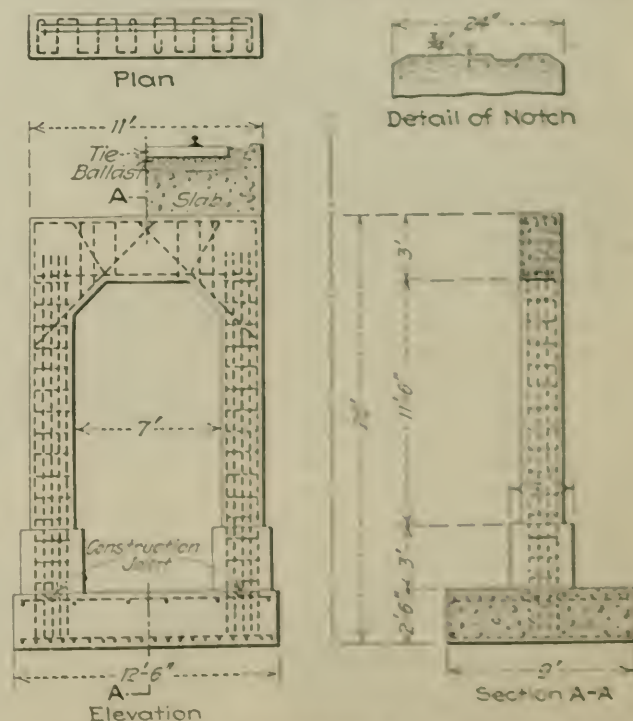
TWO-POST SINGLE-TRACK CONCRETE TRESTLE
